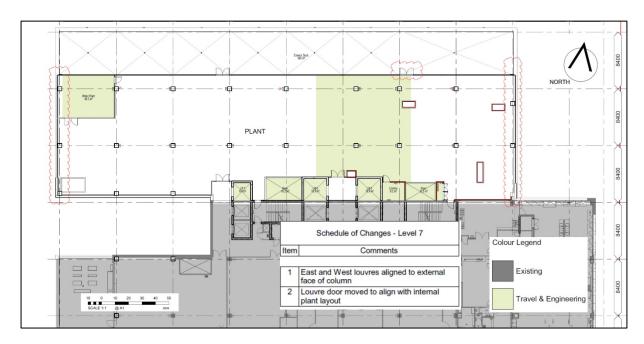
| SSD-8963-Mod-1 Proposed level 7 plan (Base source: SSD-8963-Mod-1)
